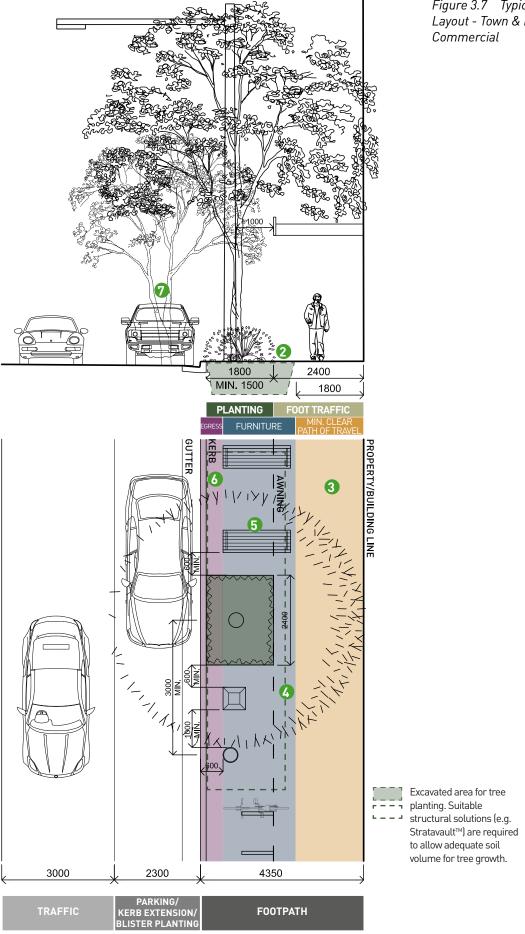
Typical Street Type Layout - Town & Neighbourhood
